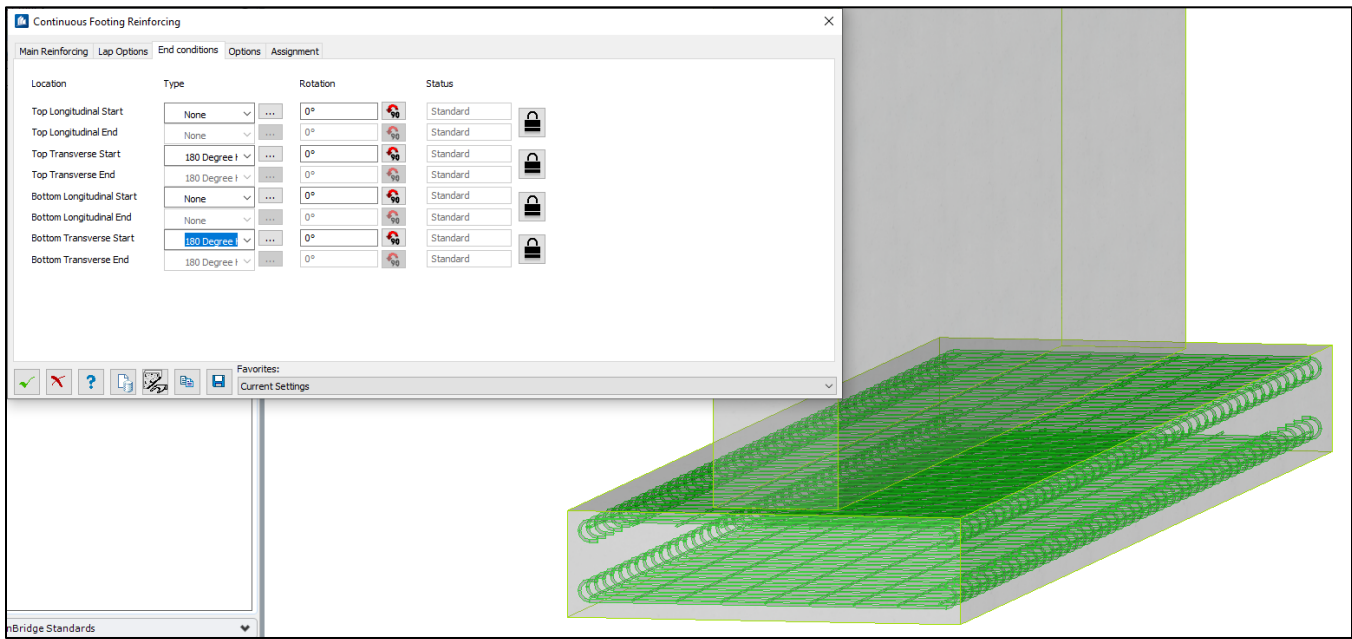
Footing Reinforcement Detailed with 180 Degree Hooks
